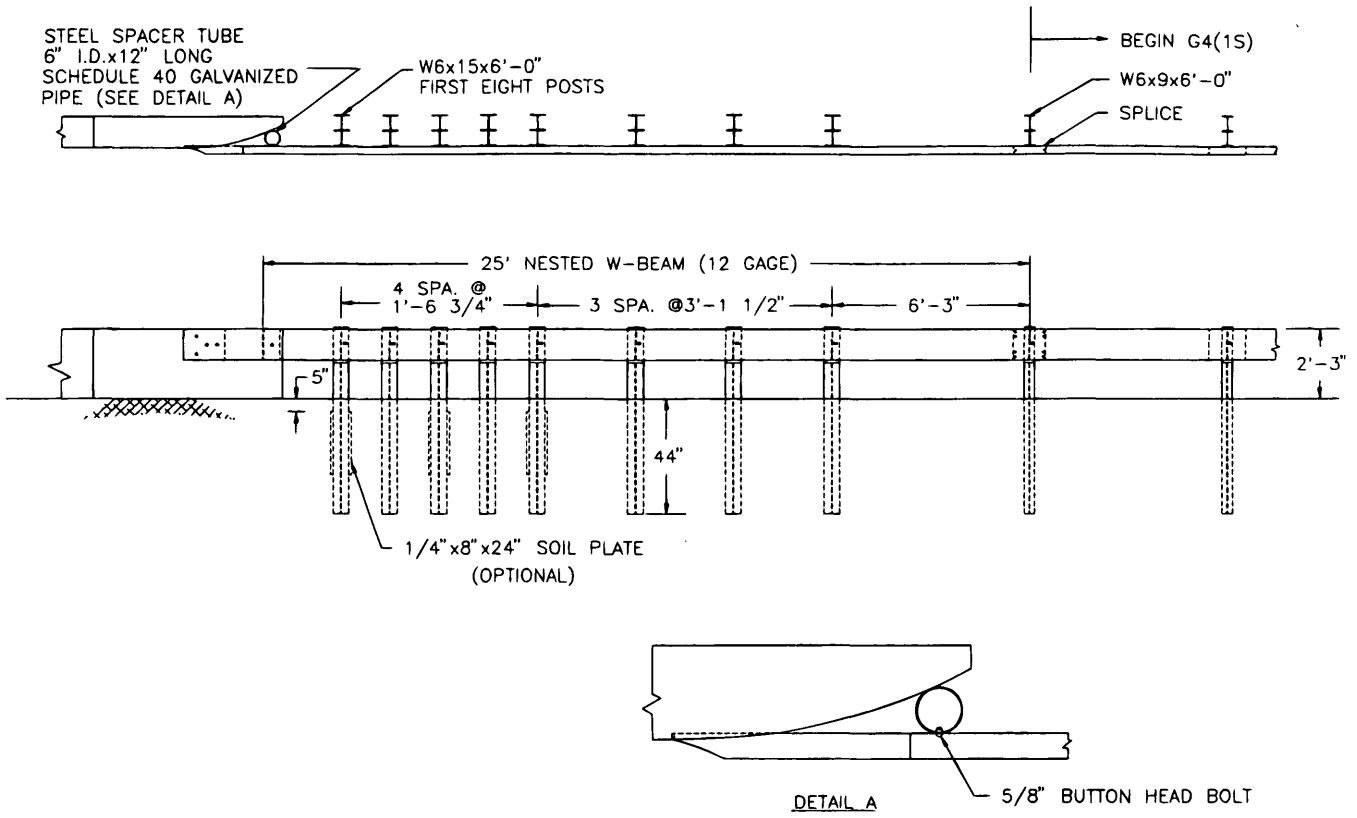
Modified steel post transition to vertical concrete parapet—reduced post spacing option.
